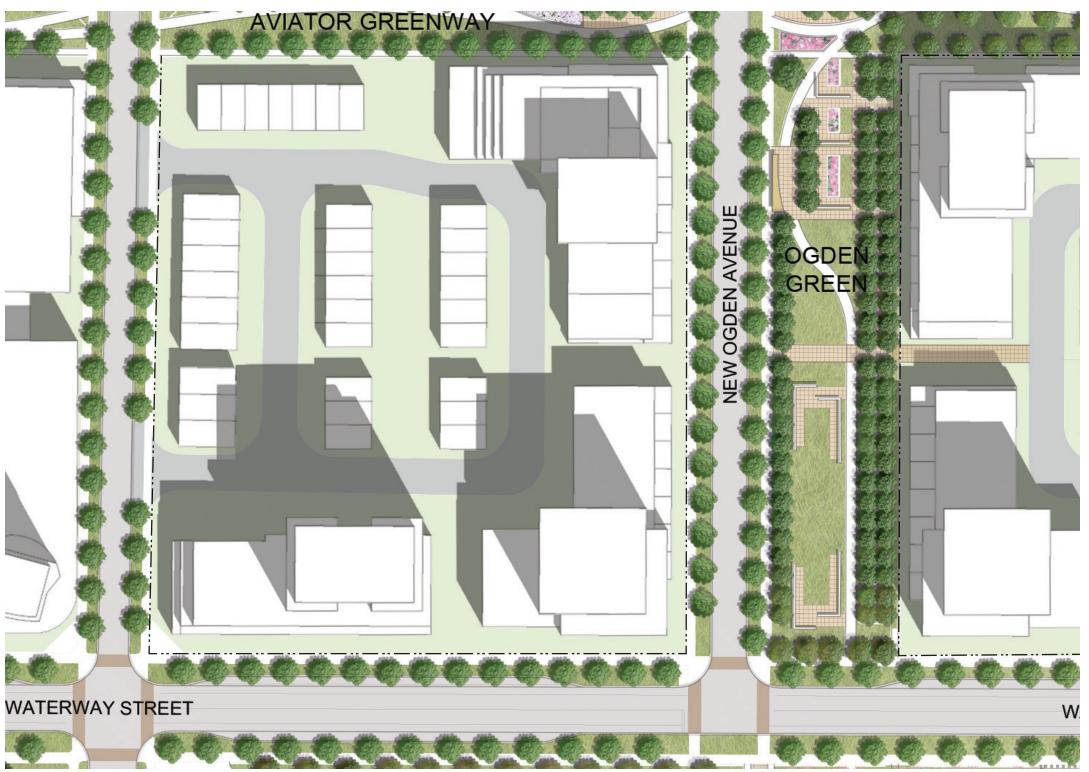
C Lakeview Village includes a variety of residential building typologies, including ground-related townhouses, low-rise and mid-rise apartment buildings containing at-grade and raised ground floor residential.
